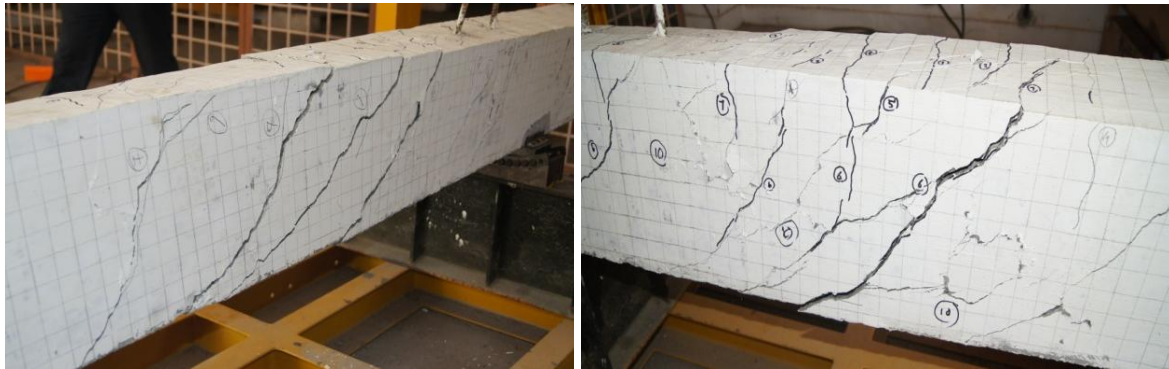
Larger diagonal cracks in GFRP reinforced beams
